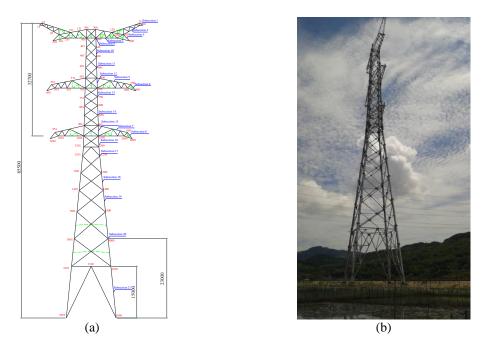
Wind pressure subsections and photo of the river crossing tower (Unit: mm): (a) Wind pressure subsections and (b) photo
